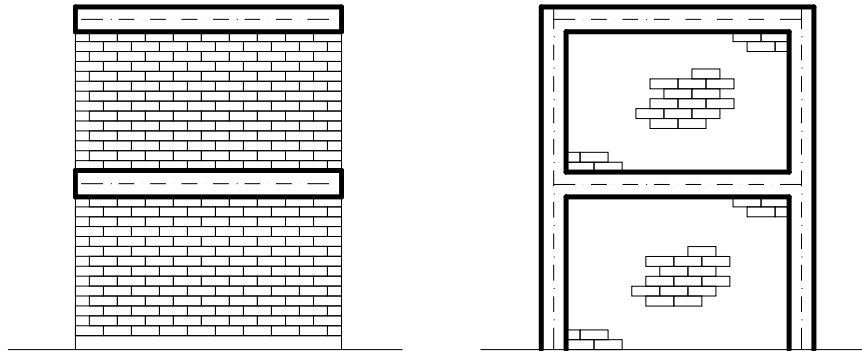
Masonry wall as main bearing element (left), reinforced concrete frame with masonry infill (right)
